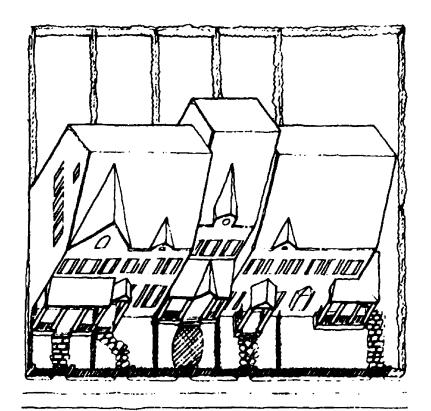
Long building walls and rooflines should be offset to provide interest and variety. The photograph illustrates building wall offsets in the Village of Lititz, Pennsylvania.
